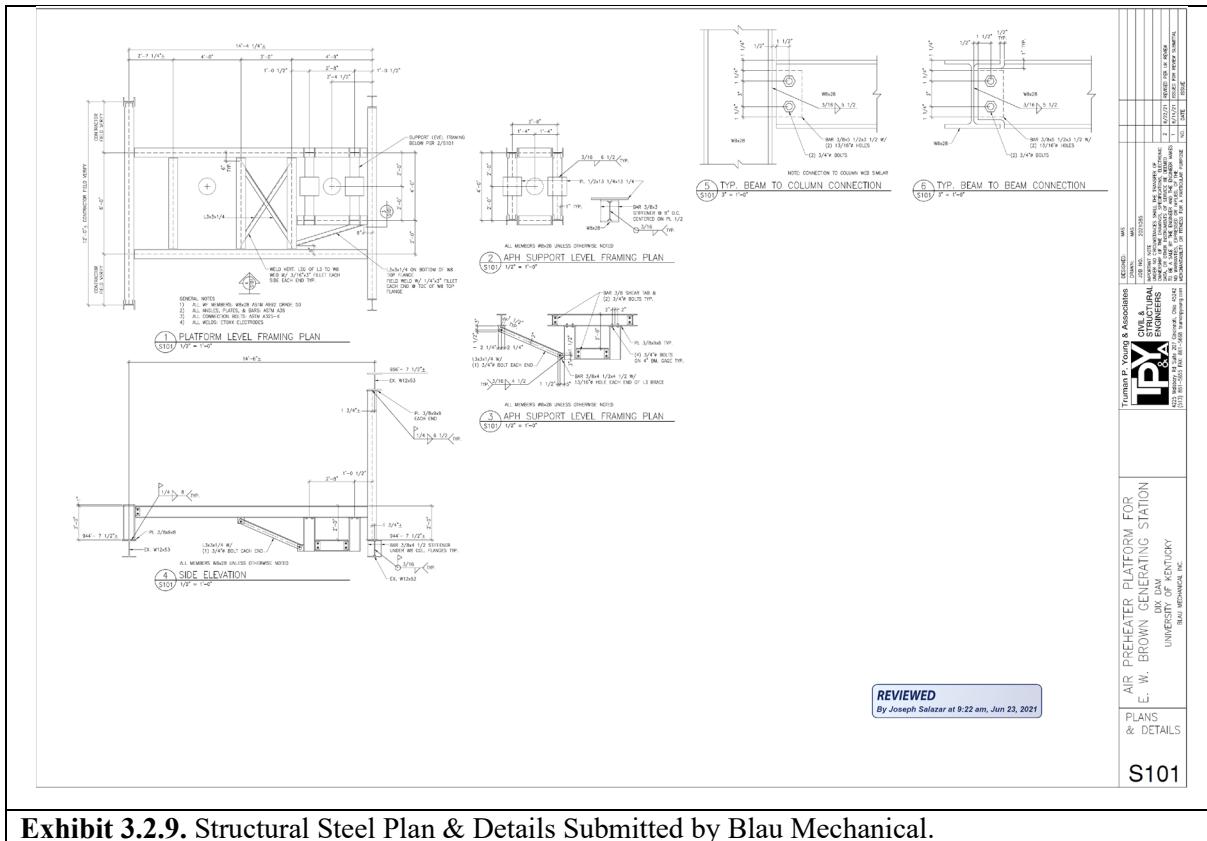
Structural Steel Plan & Details Submitted by Blau Mechanical.
